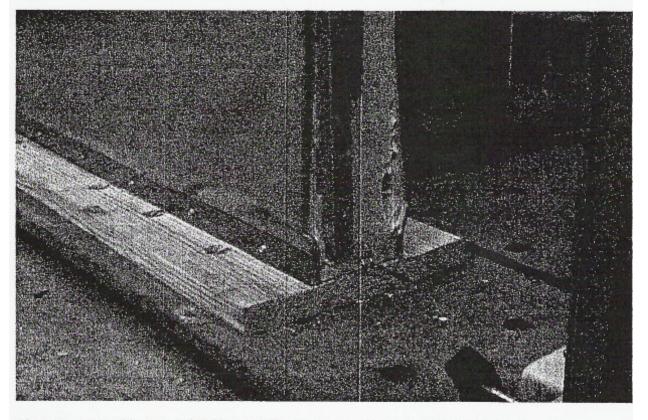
Closeup of Failure of 8' Galv.-Galv. Panel Under Racking Loading
